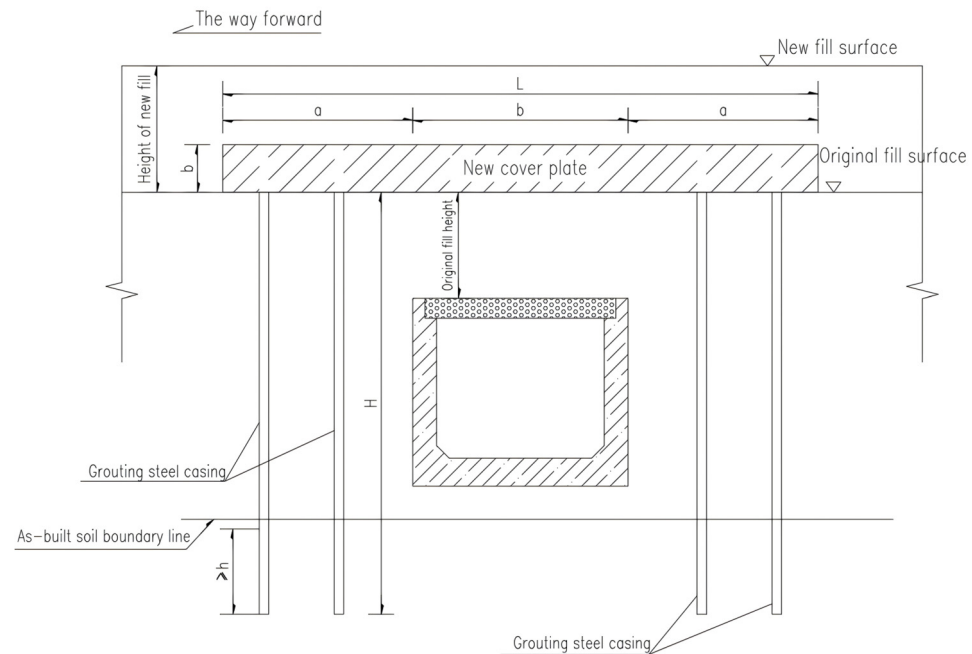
Schematic diagram of the additional deck slab reinforcement method.
